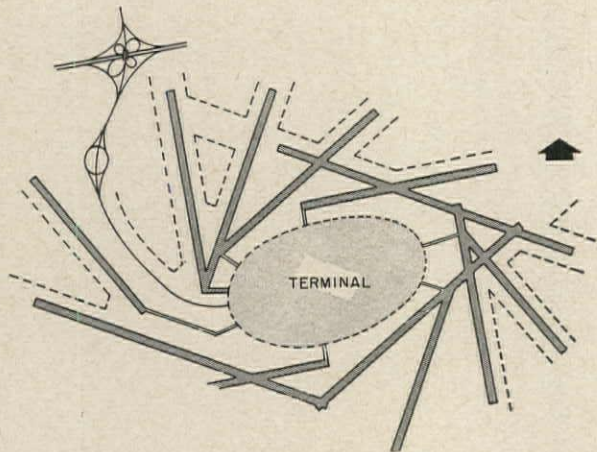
Master plan of 1947, based on a system of tangential runways around central passenger area
